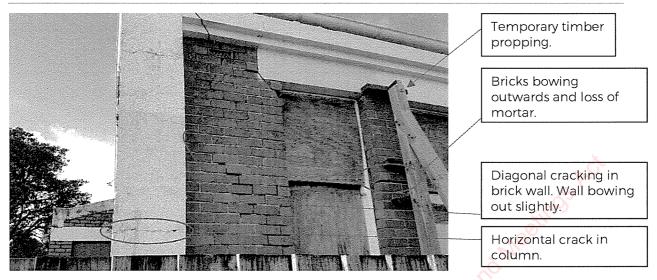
North-West corner of Old Court House showing damage to brick walls
